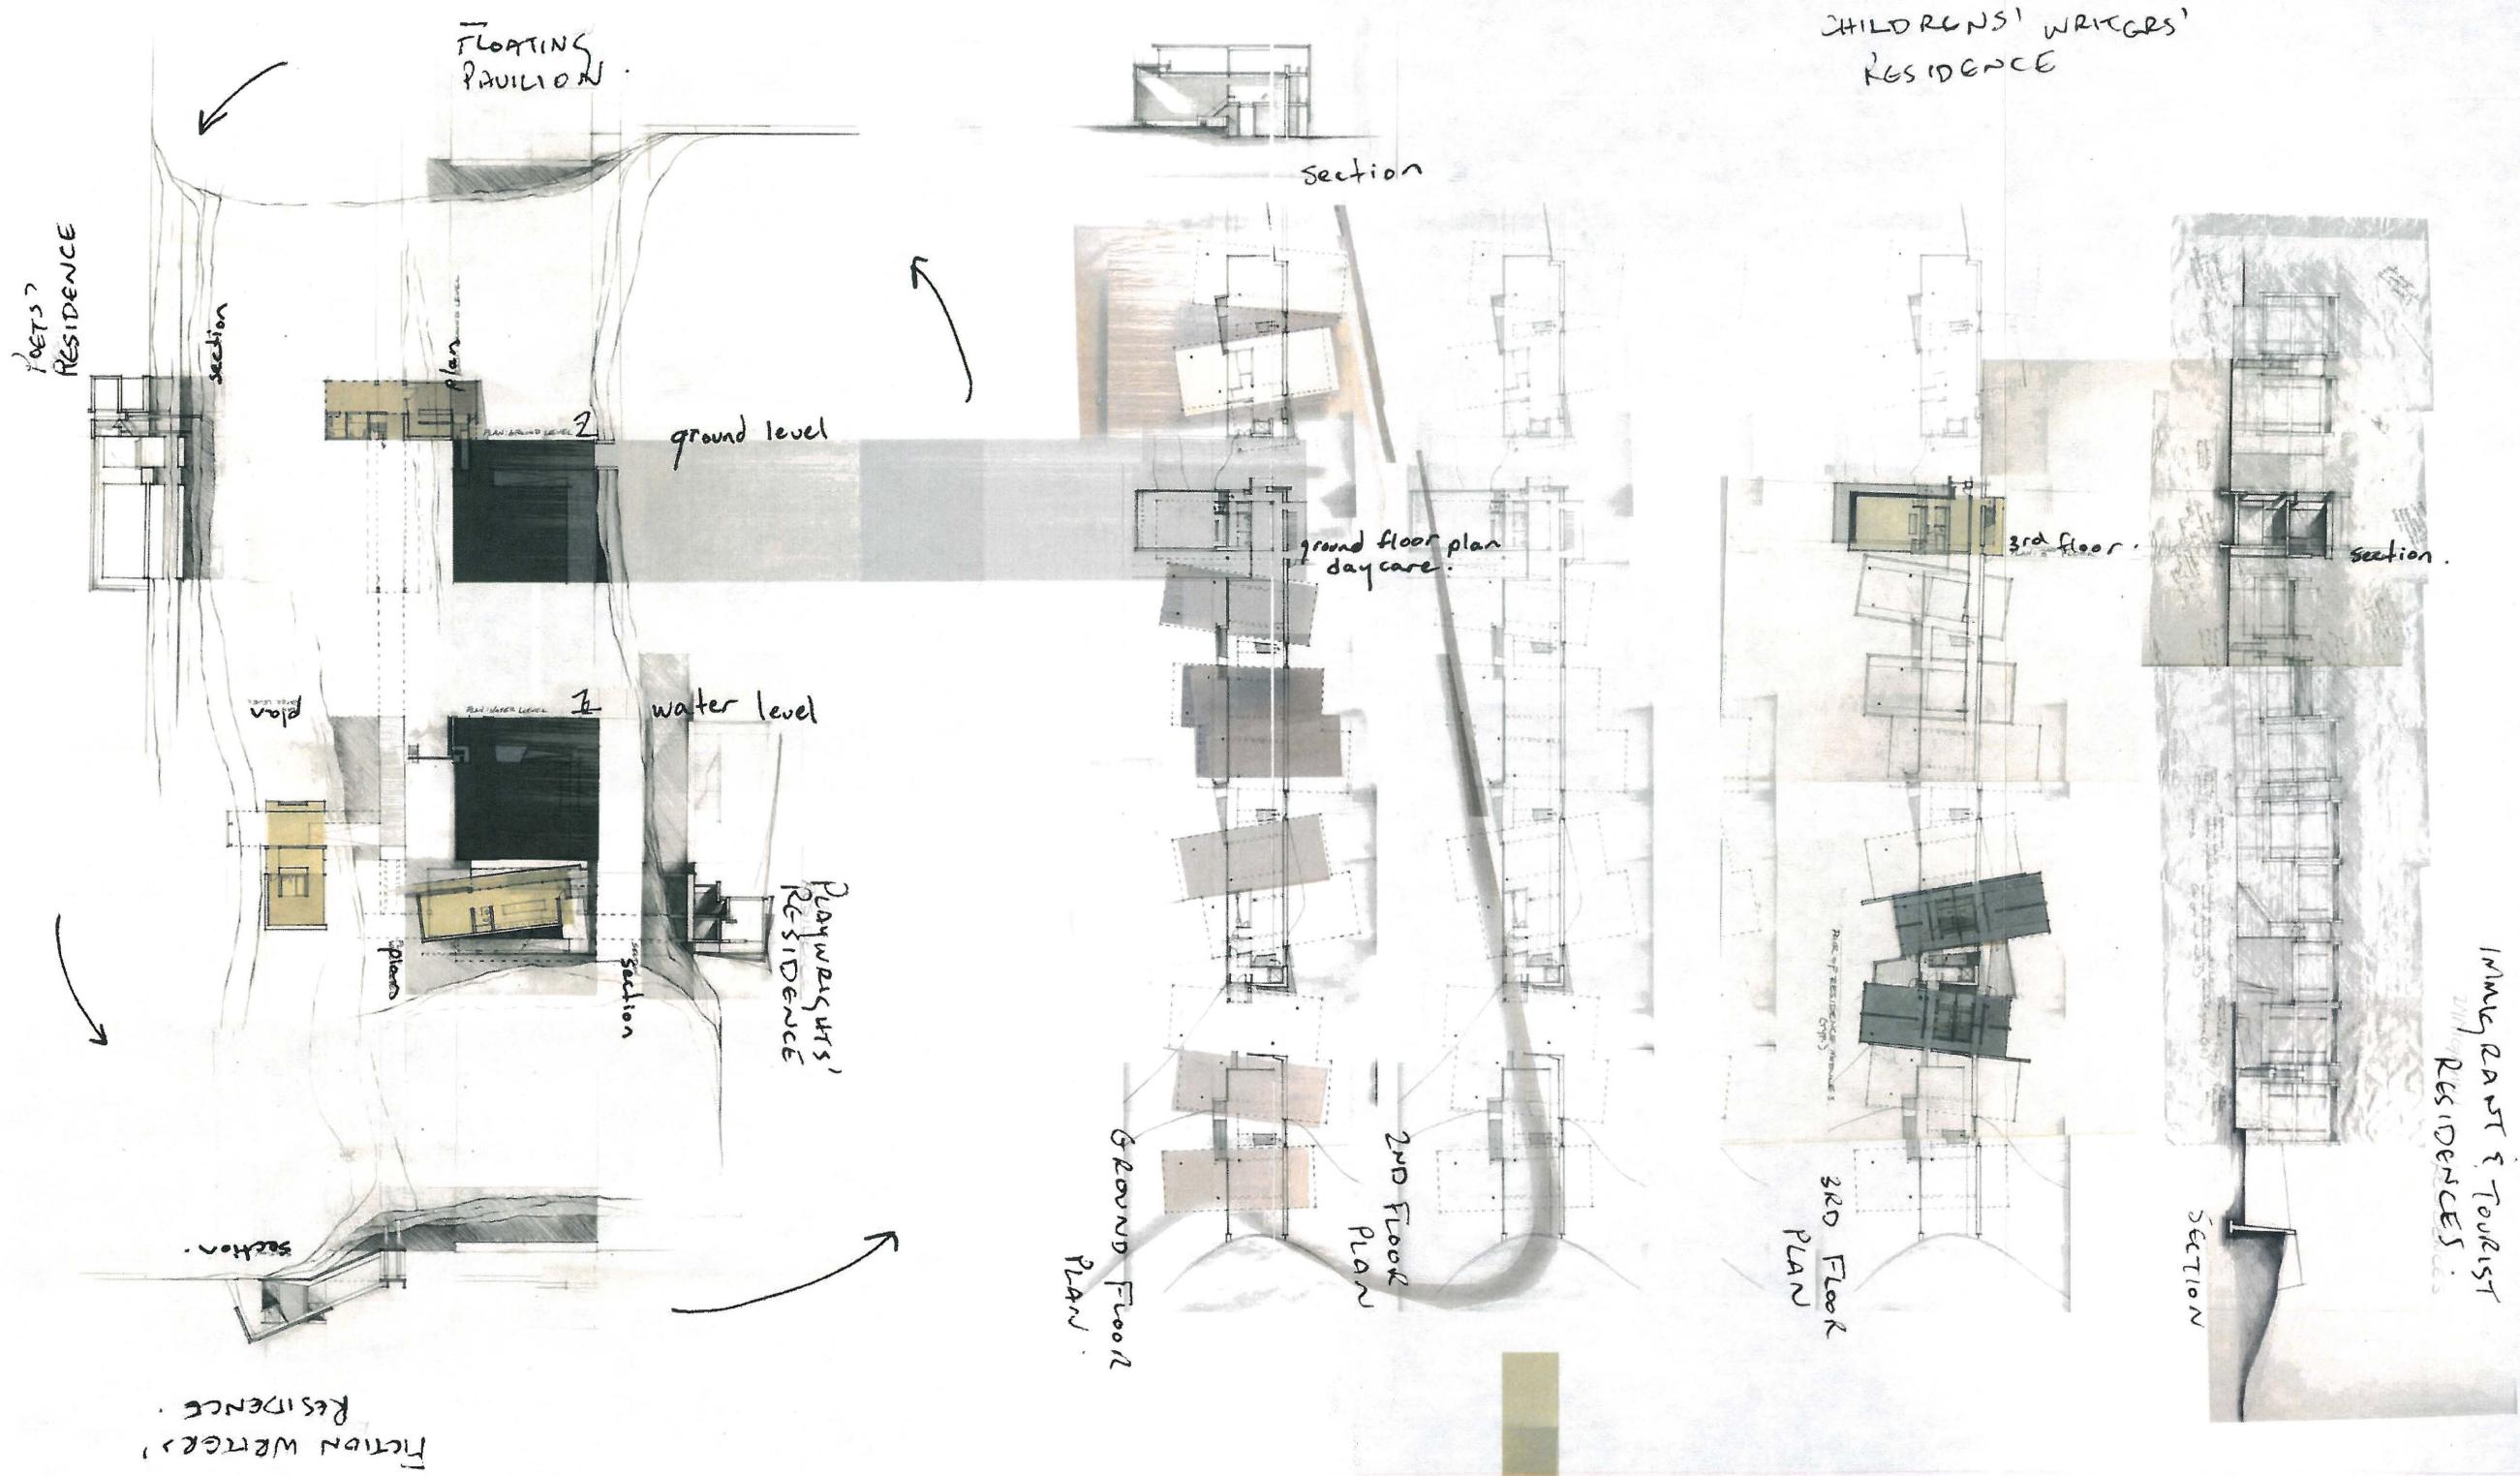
Plans and sections of showing how each fixed building connect to floating pavilion, composite drawing, 2006, created by author.
